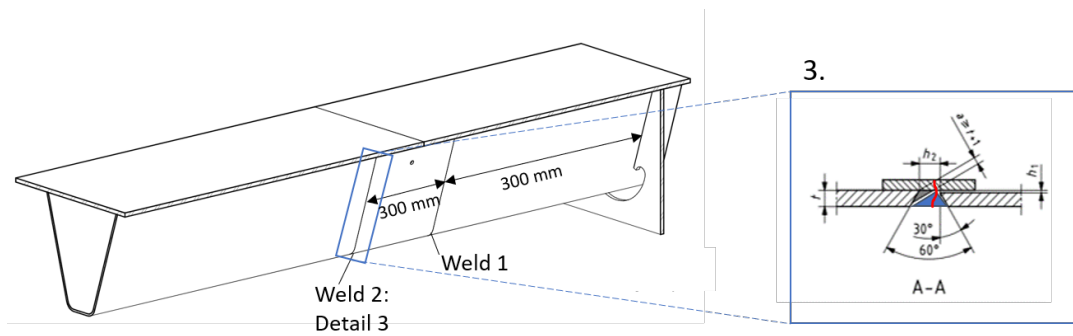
The third fatigue detail that will be considered in the optimization: the splice between two trough sections. Only the second weld is considered, as it is most likely governing. The connection is formed by a butt weld with backing strip (figure on the right). The blue triangle represents the weld material that will be deposited and the red line indicates an approximate fatigue crack location. Cracking is most likely to occur on the bottom side of the trough [2].
